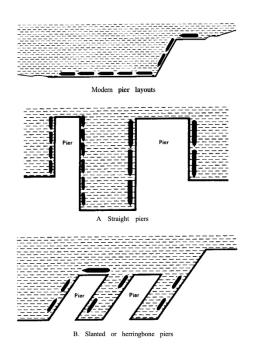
Berthing area layout (UNCTAD, 1985)
